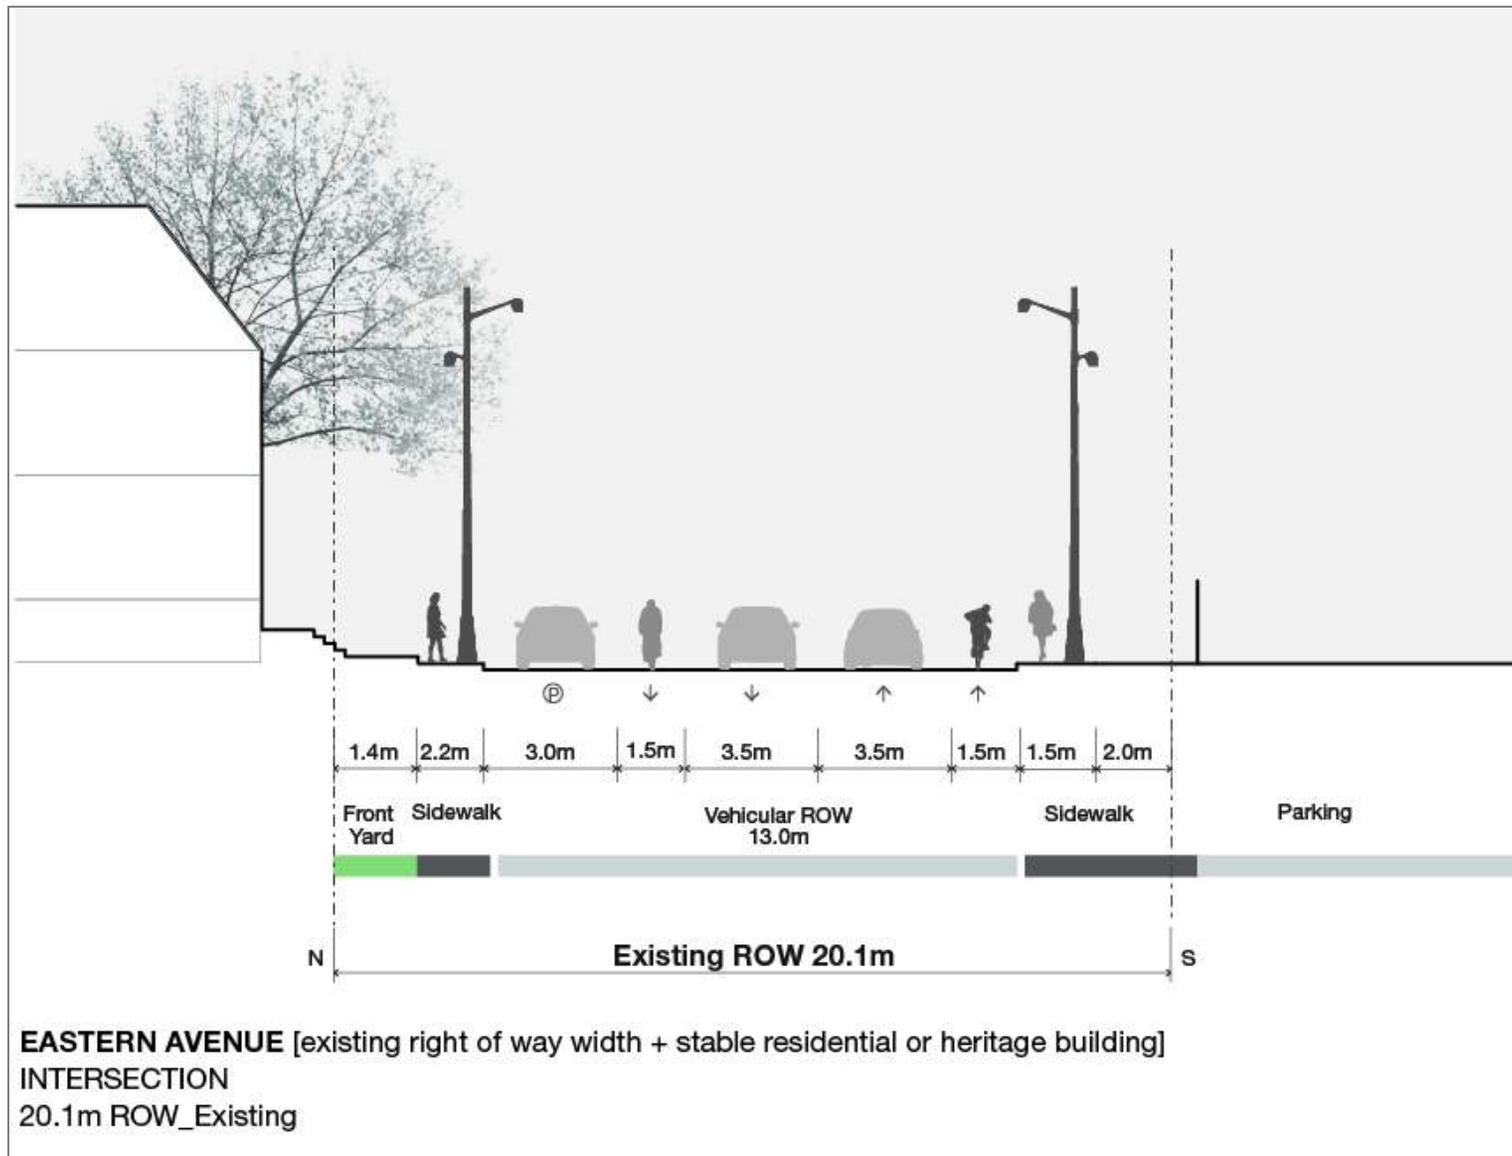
CROSS-SECTION – EXISTING EASTERN AVENUE, EAST OF LESLIE STREET
